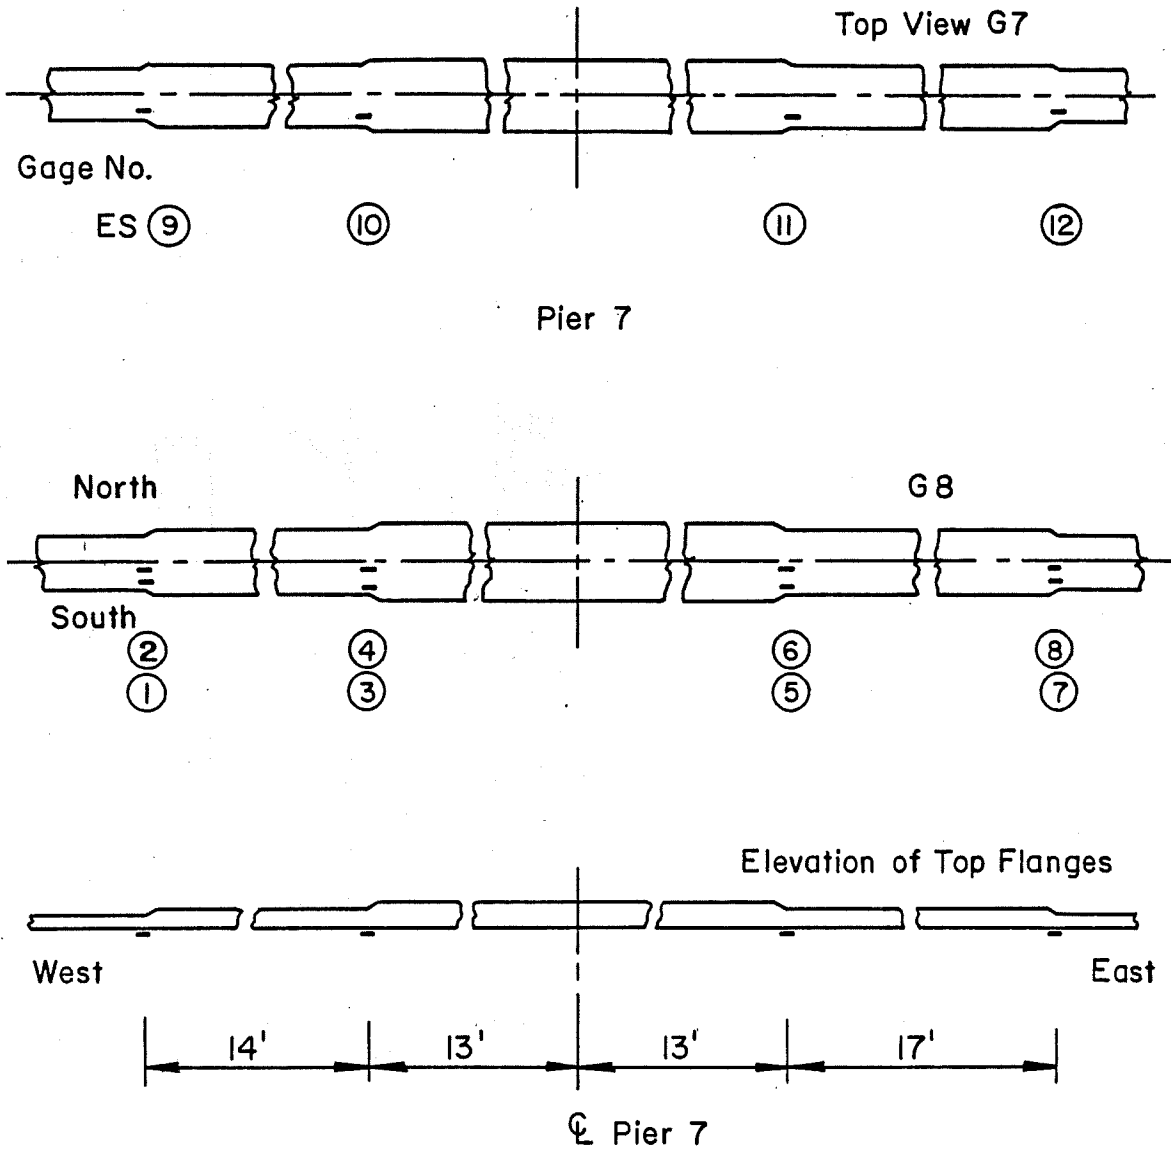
Location of Strain Gages at Top Flange Electros lag Welds
